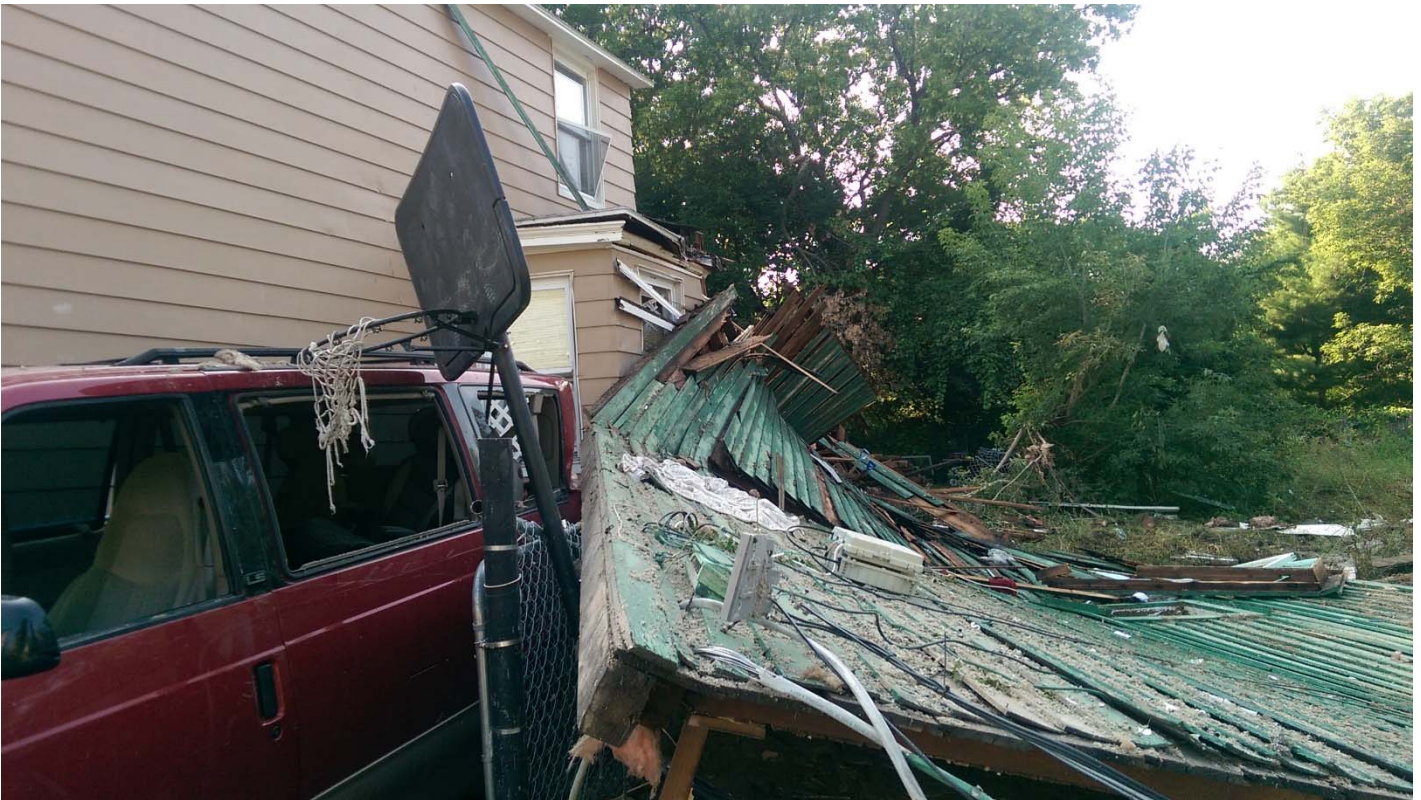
(8/10/2014) - 314 Paige Street exterior damage.
